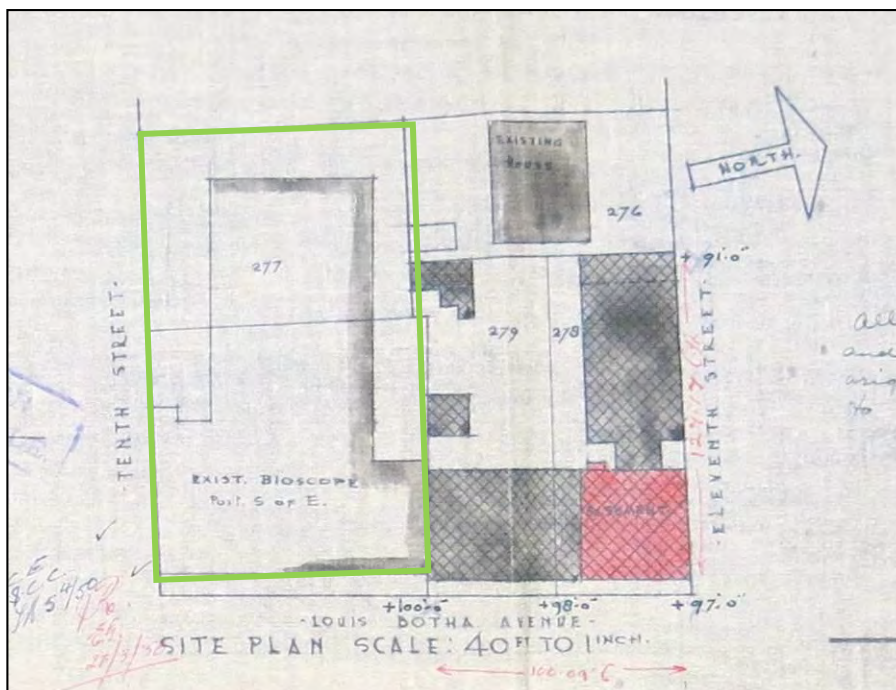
Original site plan from 1949 showing existing Bioscope on Stand 277 & Port. 5 of E on the corner of Tenth Street and Louis Botha Avenue, Orange Grove
